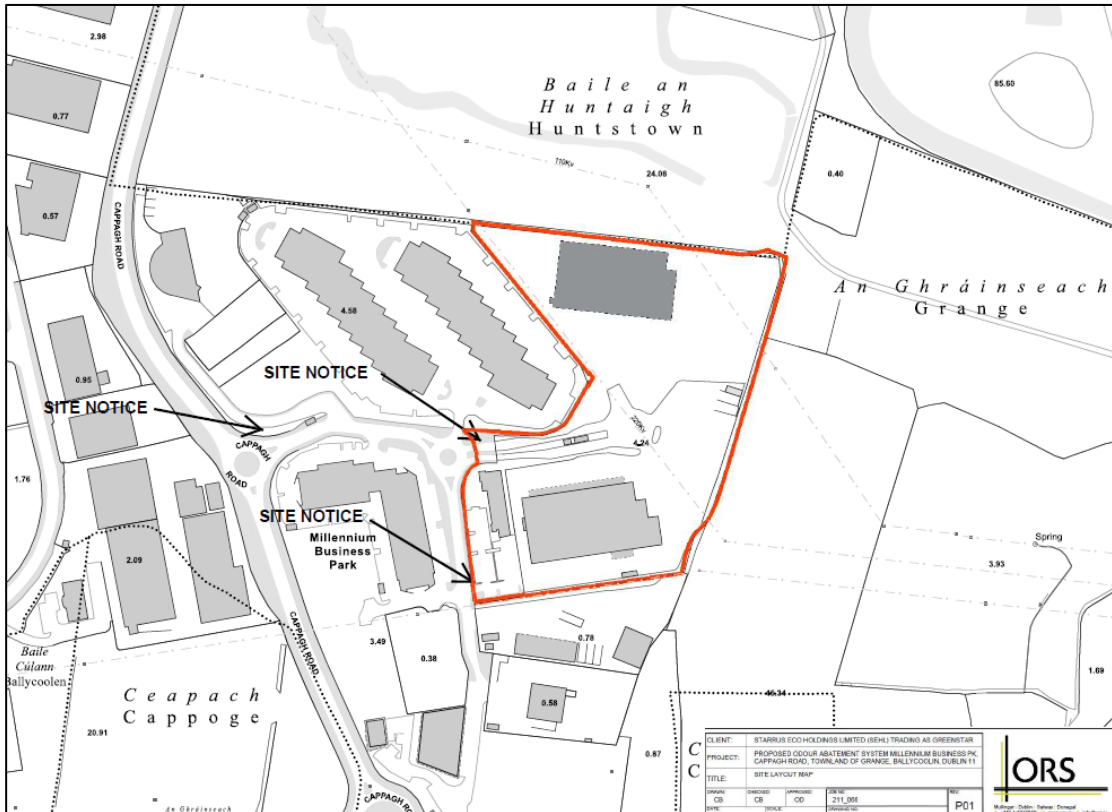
Site Location Plan – Subject Site Outlined in Red. (Source: ORS).
